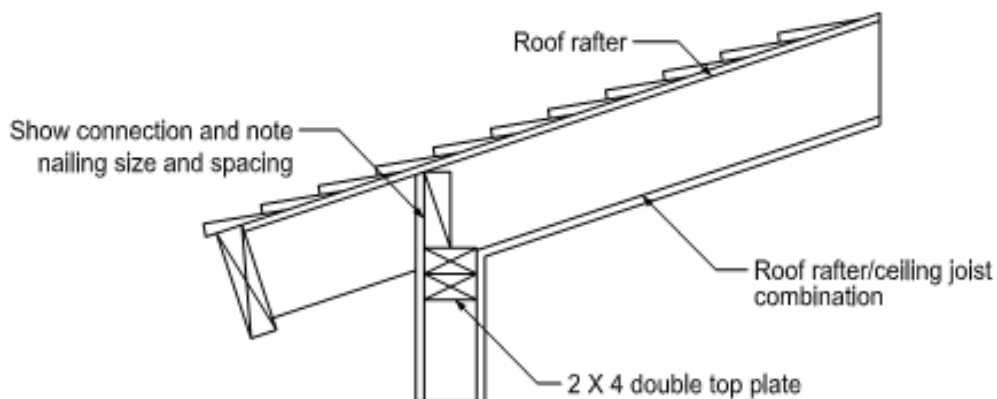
Detail B / Typical Roof Connection, Load Bearing Ridge Beam
